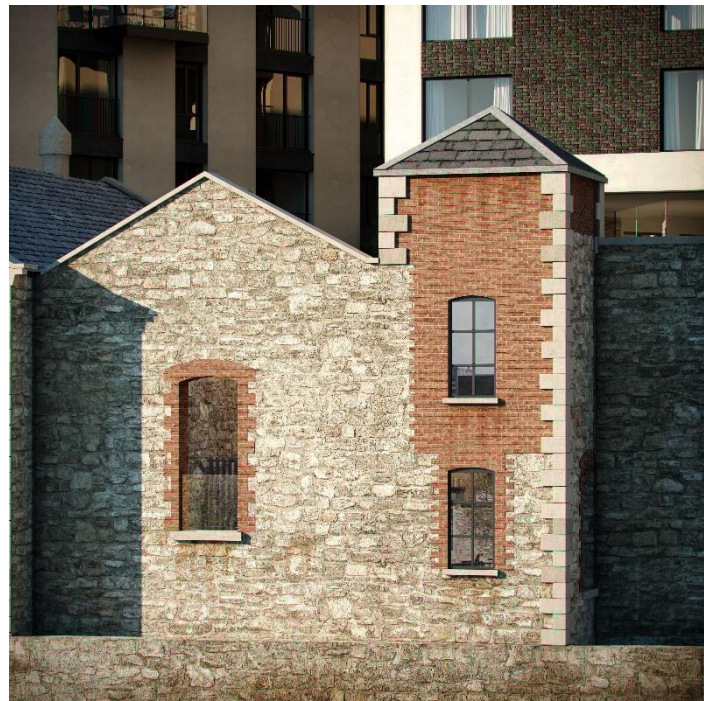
View of proposal showing restored Quay Wall and River buildings
